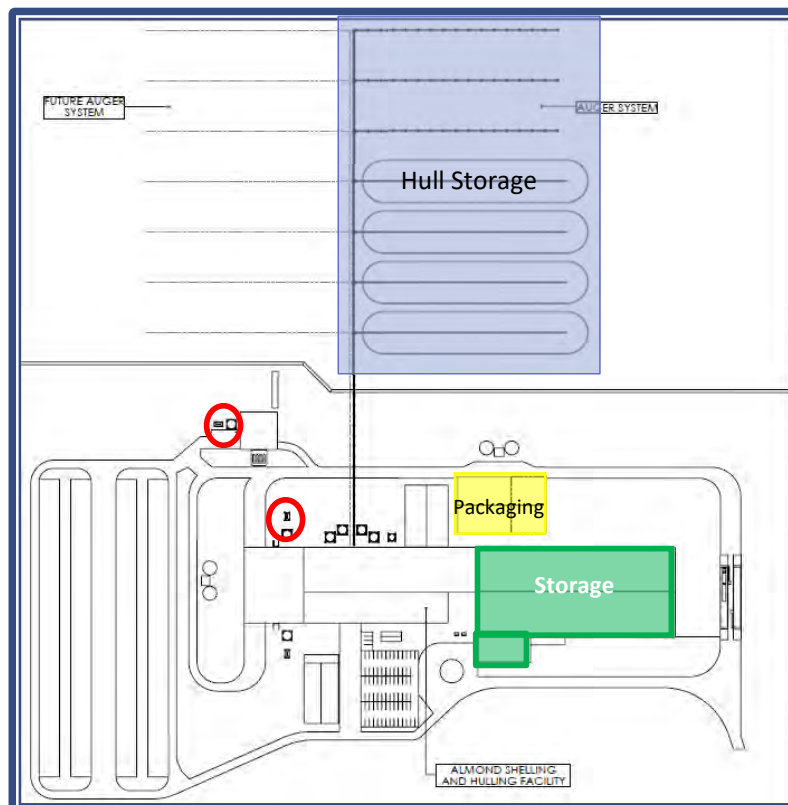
Image identifying proposed storage facility layout (Source: JMA Engineering Sheet A101)
